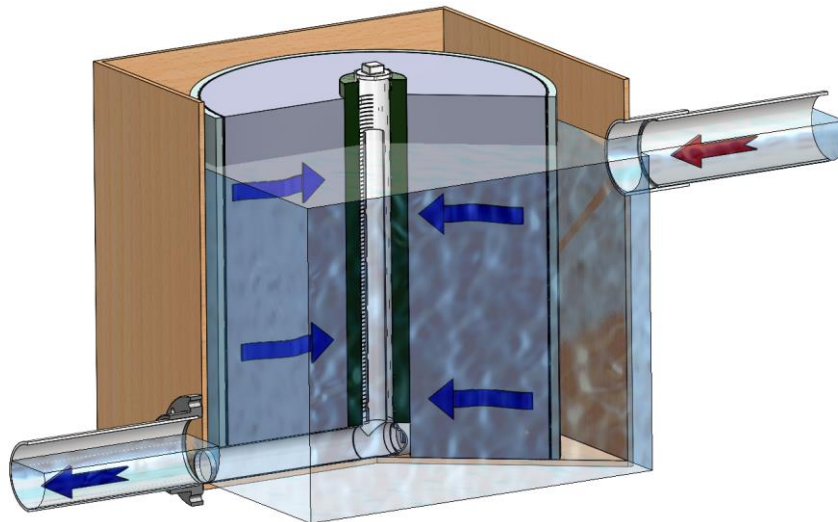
MW360-4-4 Test Unit - Cutaway View - Flow Path Shown
